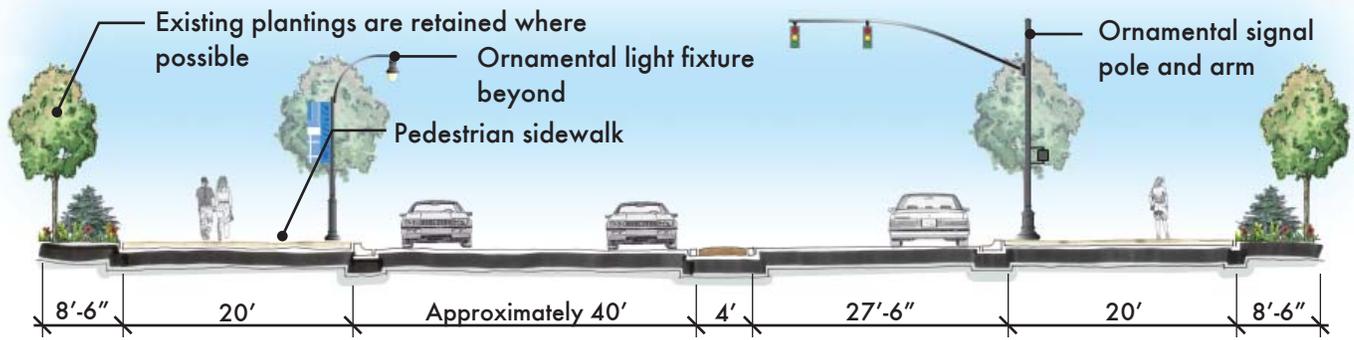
Typical cross-section near primary intersections illustrating decorative signal poles, ornamental lights and a tapered median constructed of colored pavers.
